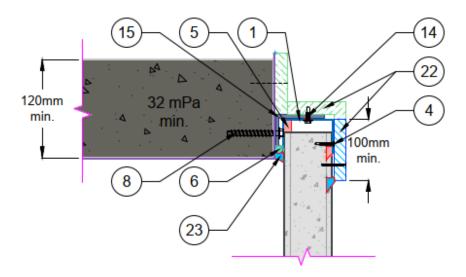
Head – vertical or horizontal wall connected to stringer via structural support (section view)
